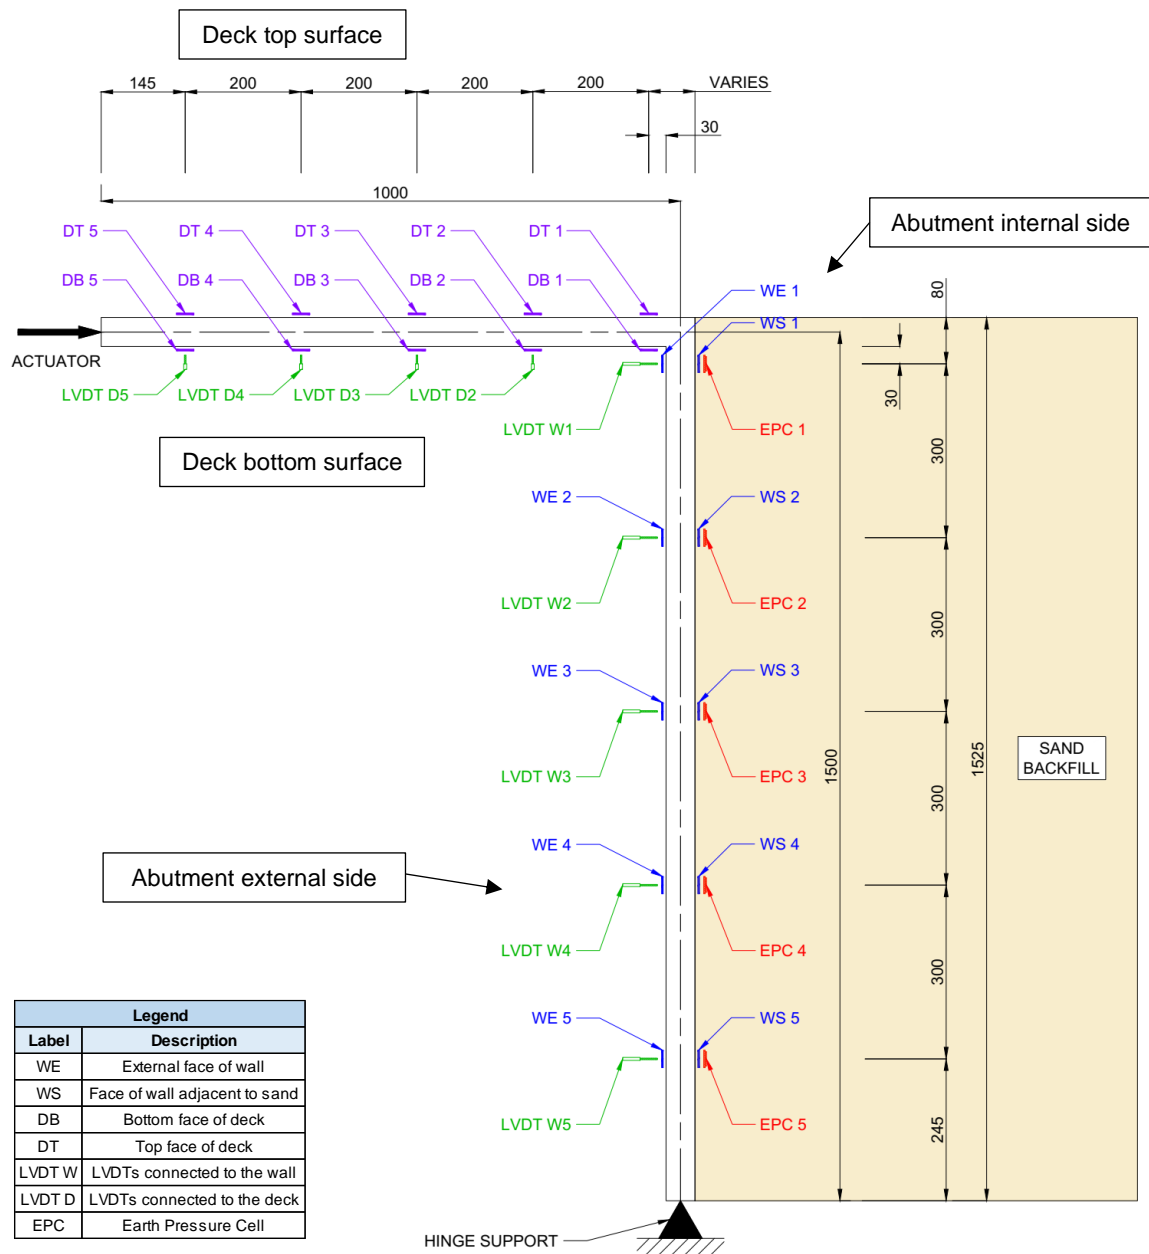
Sensors installed onto abutment specimens (dimensioned).
